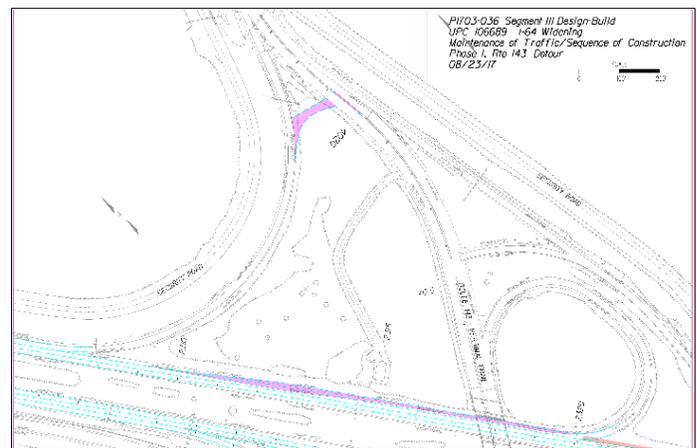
Route 143 to I-64 WB loop Ramp Detour
